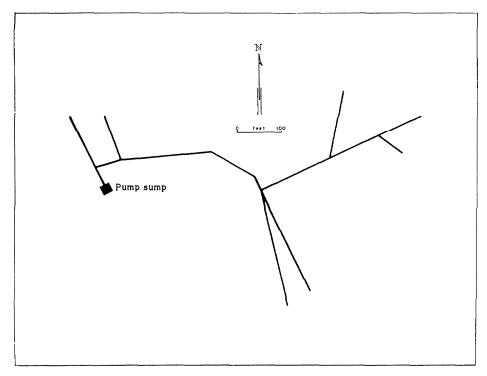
Plan of tunnel system at shaft 6, McBryde Sugar Co. pump 3.
